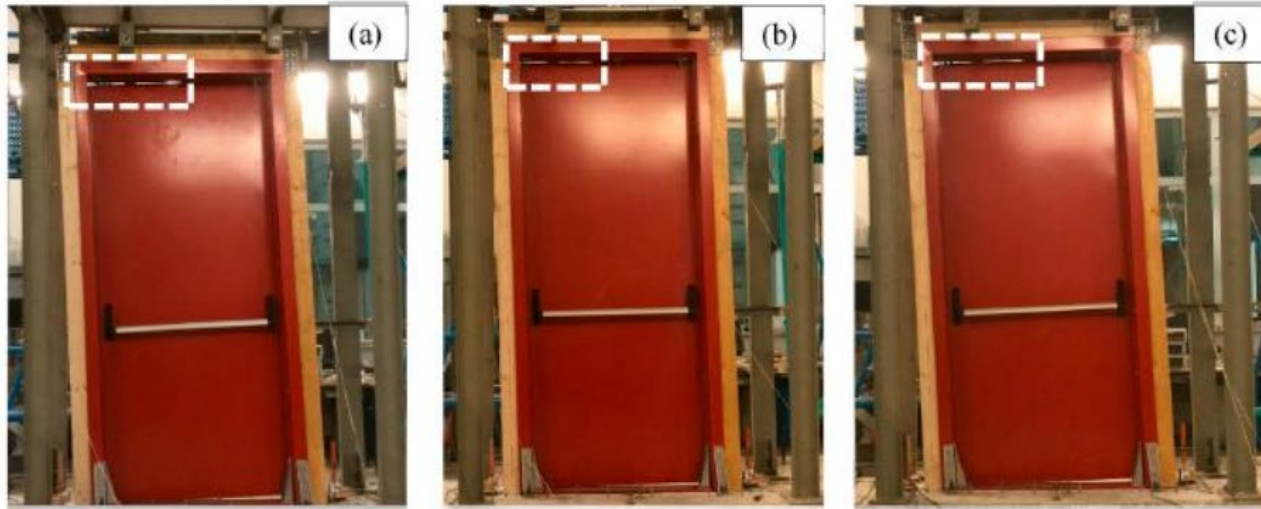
Observed damage to fire door sets under lateral drift [Calayir et al., 2022]: (a–c) Permanent distortion of three 90-min fire door specimens at their failure inter-story drifts ($\sim 1.9\text{--}2.3\%$ IDR) – note large gap openings at top corners and tearing near the locks
